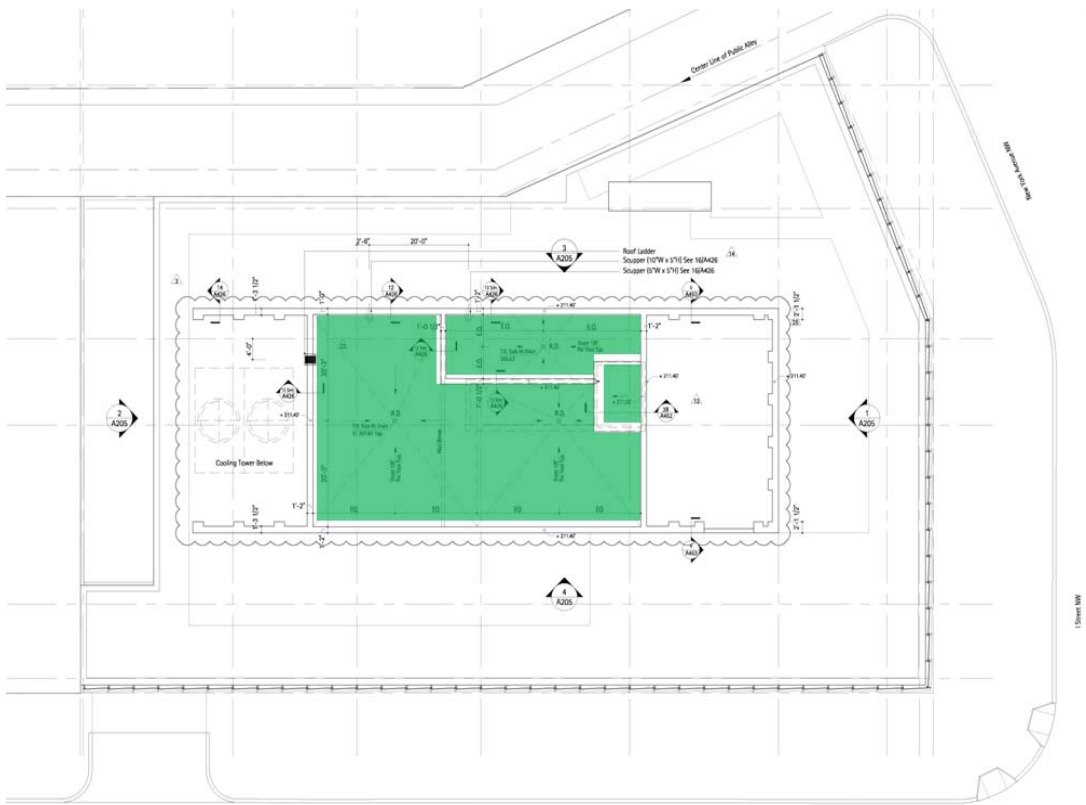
Suggested green roof layout for penthouse roof area. Total area is equal to 2,876 sq ft.
